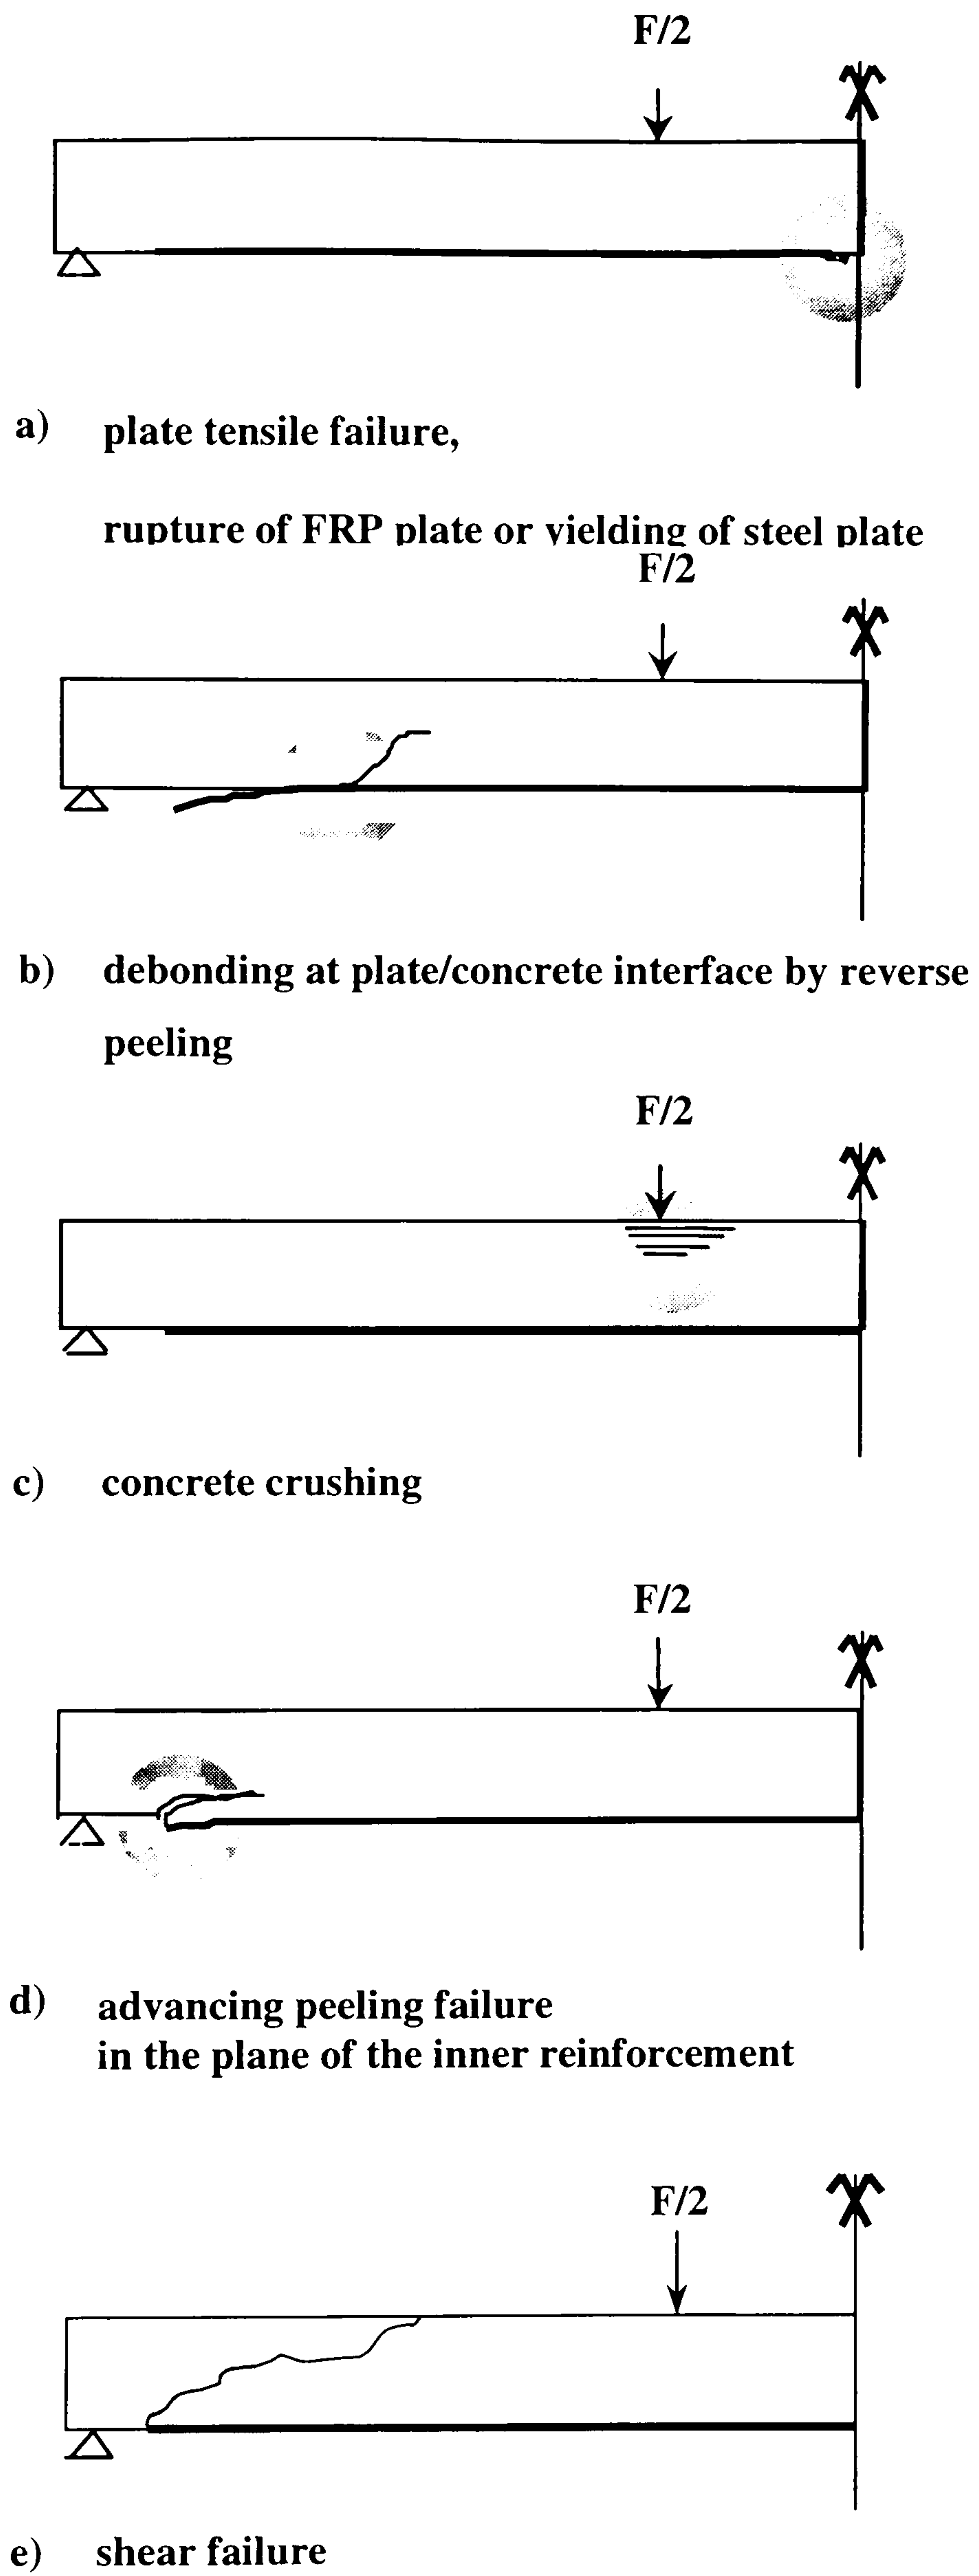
Classification of the failure modes of externally plated reinforced concrete beams
